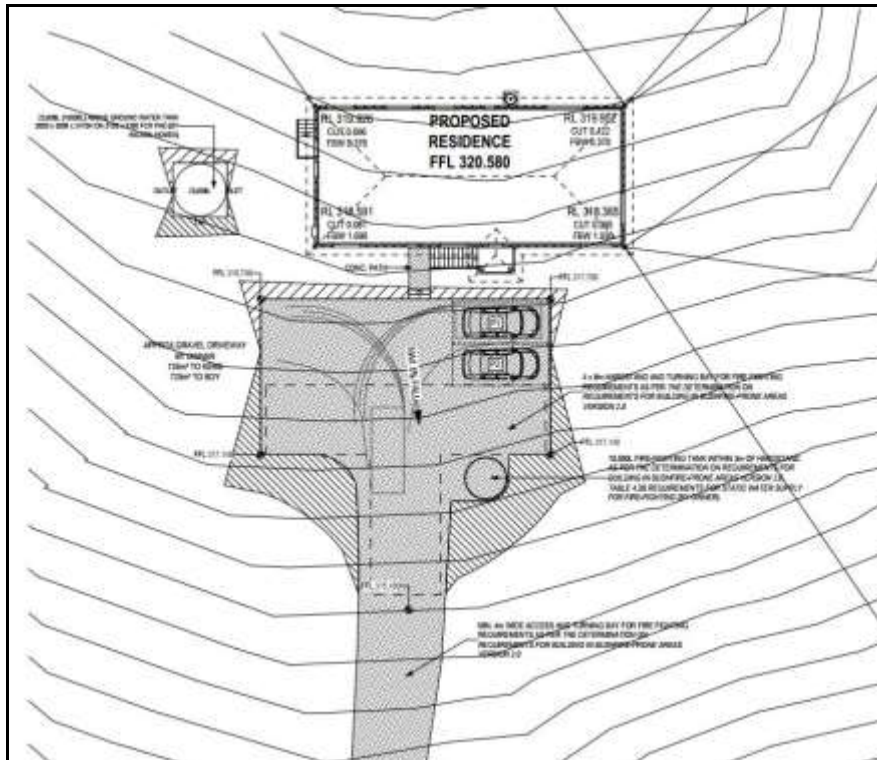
Site plan showing extent of cut and fill require for the access and parking. It is estimated approximately 13.17m³ will be cut to facilitate construction of parking area.
